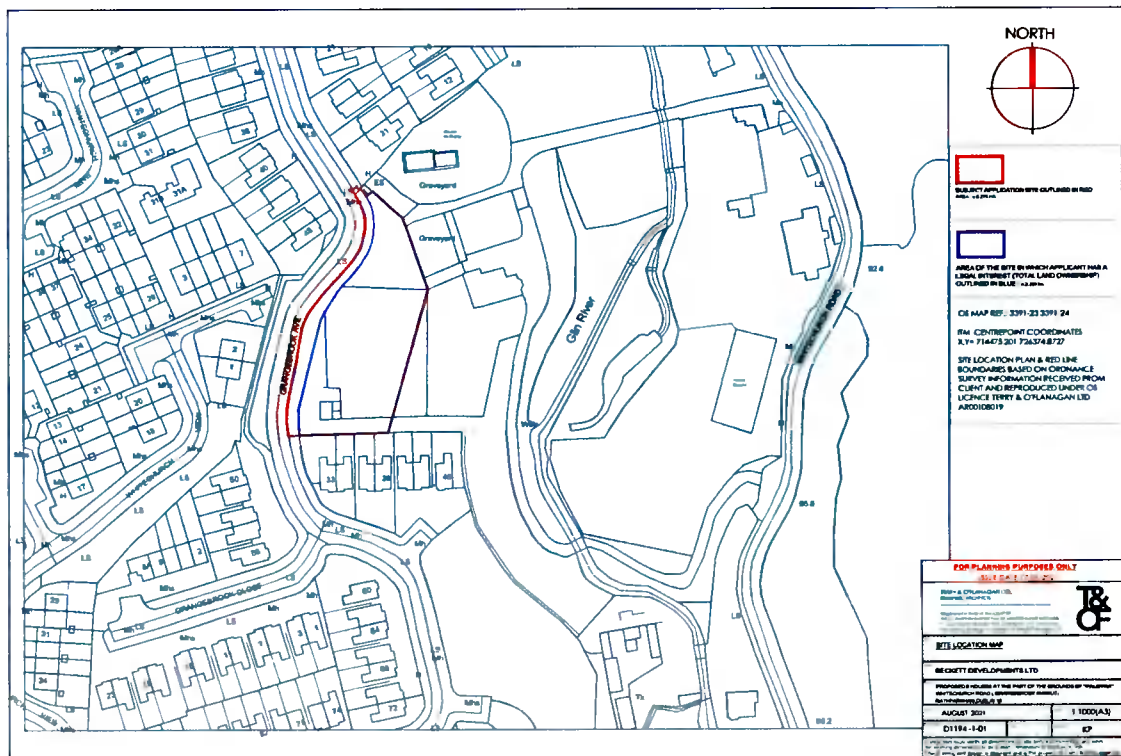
Palmyra and grounds, with Whitechurch Graveyard immediately to the north
